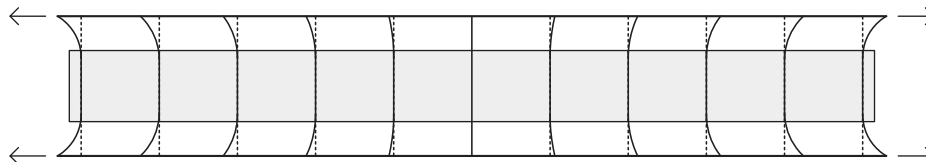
Elongation of the longitudinal beams may cause movement in the transversal beams which are prevented to move by the concrete deck.
